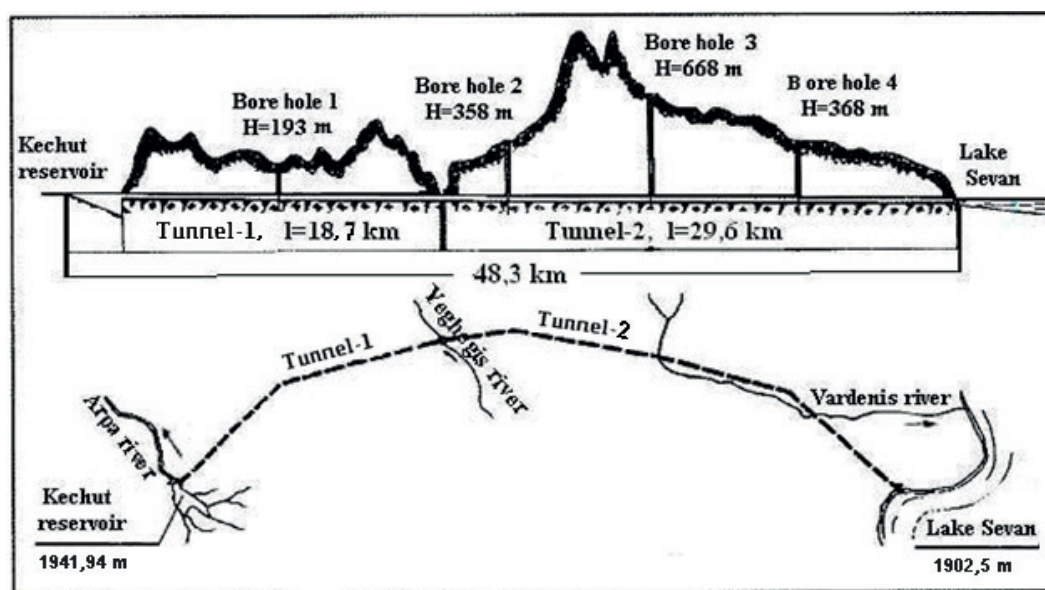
The Plan of Arpa-Sevan Tunnel (Vardanian et al. 2007)
